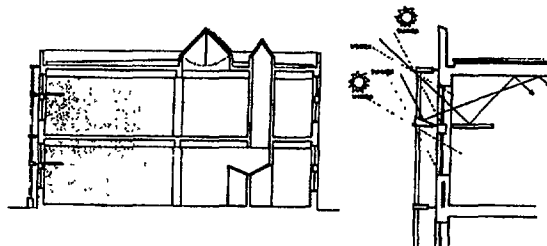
Cross elevation showing two classrooms and light shelves detail
